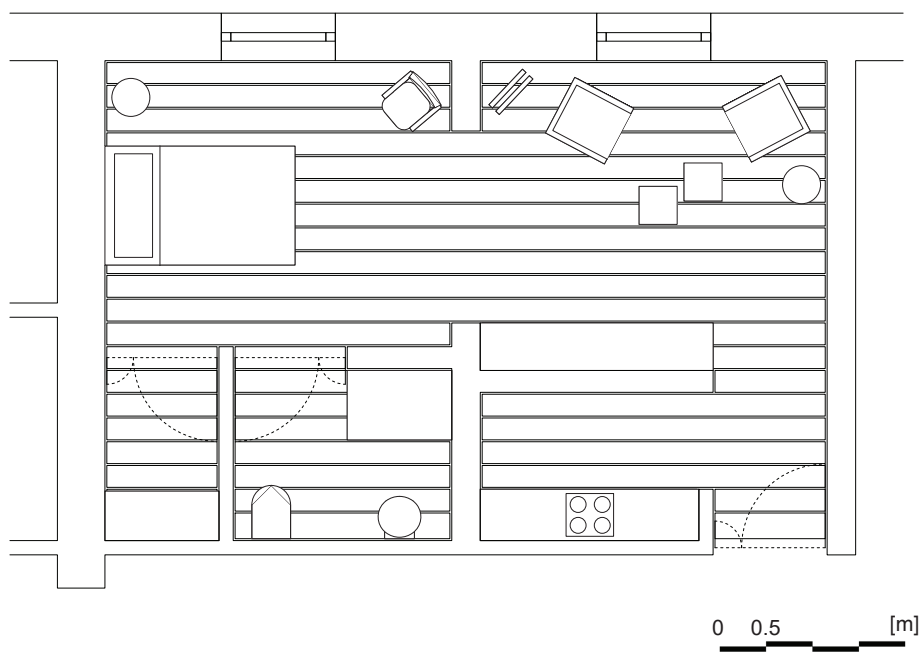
Standard 1-Room Apartment Floor Plan © Davide Landi
